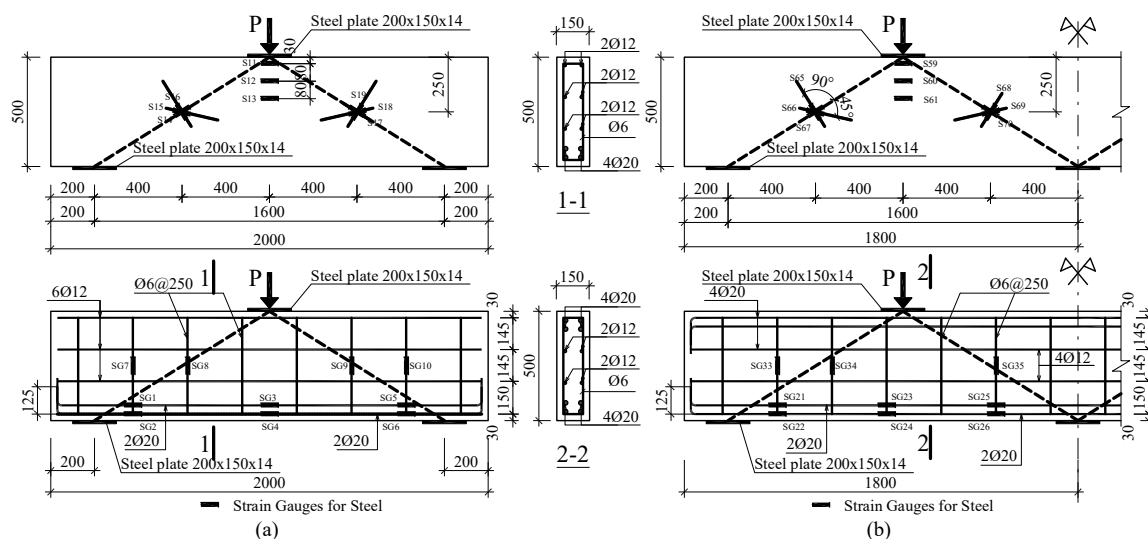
Specimen dimensions and reinforcement details: (a) Simply supported beams; (b) Two-span continuous beams
